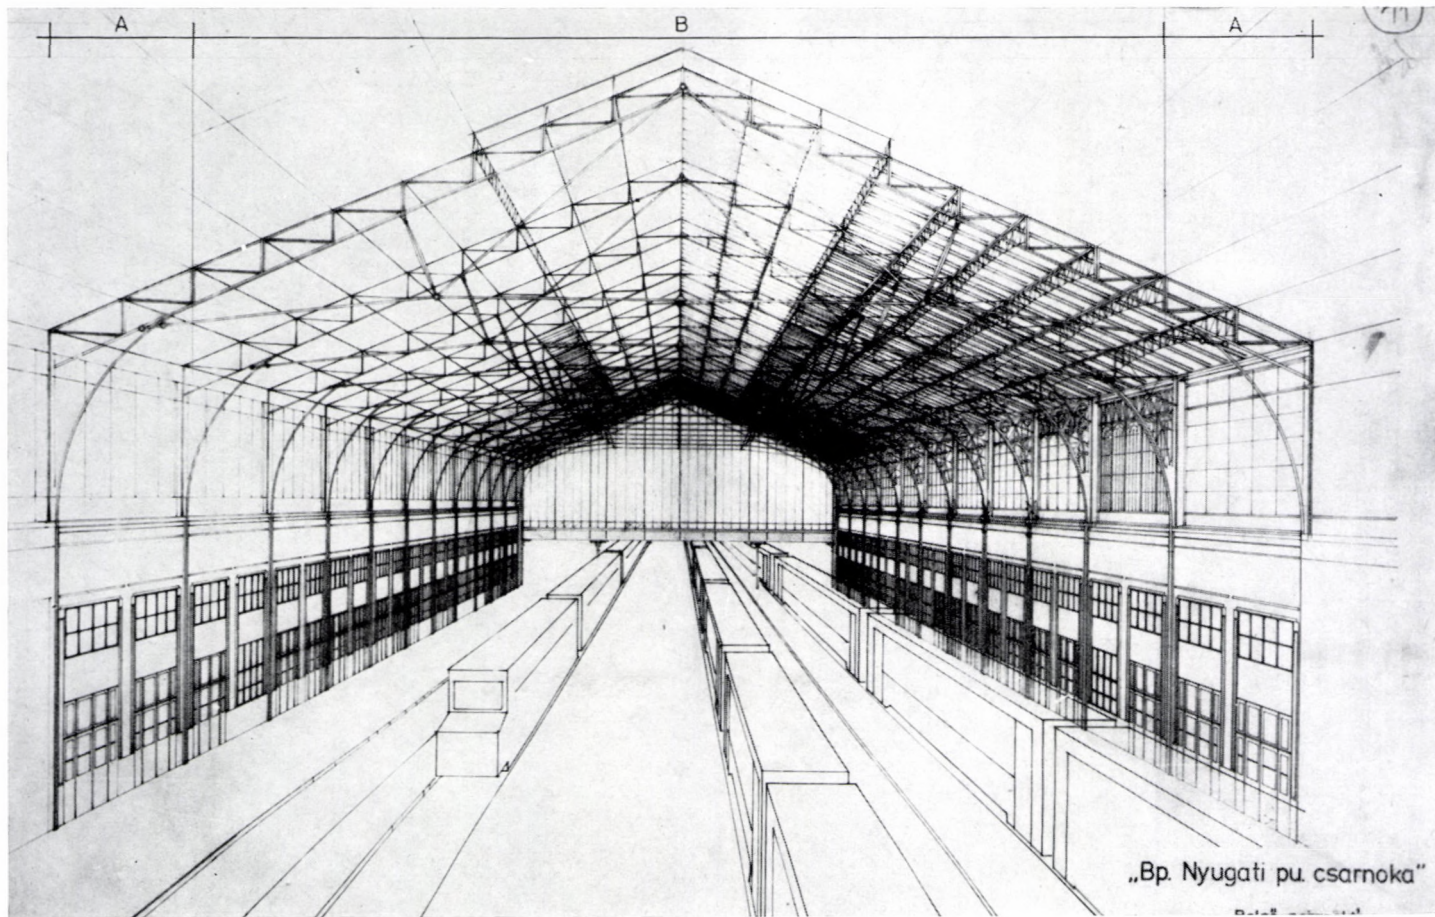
Perspective view of the accepted tender design, approved as a basis for the reconstruction of the main hall steel structure: (a) remaining parts of the original steel structure; (b) the new central part of the steel structure
